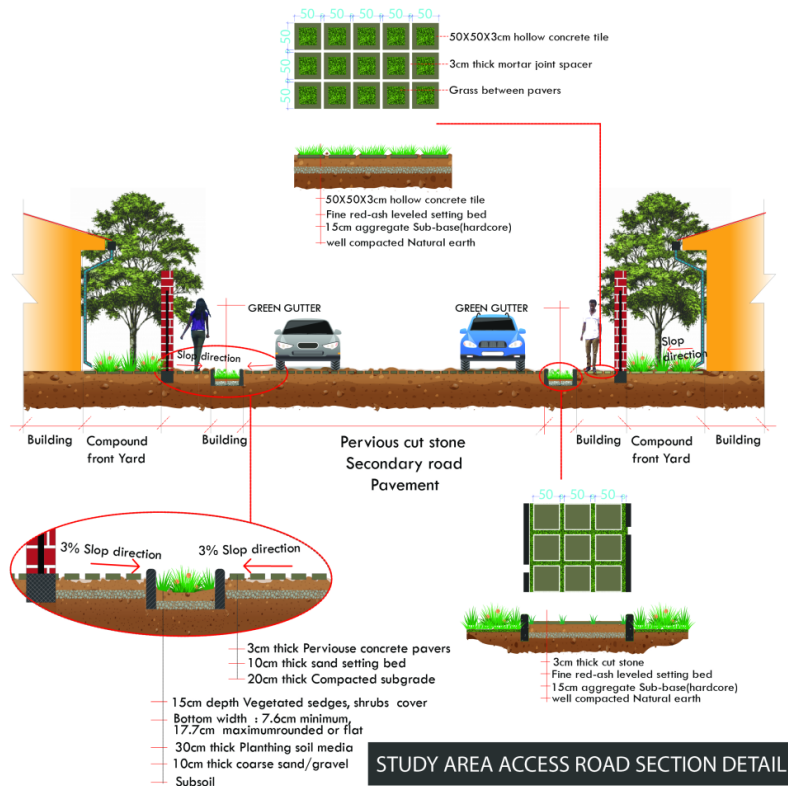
Cross-sectional view of proposed driveways and walkways at both watershed areas (Author, 2020)
